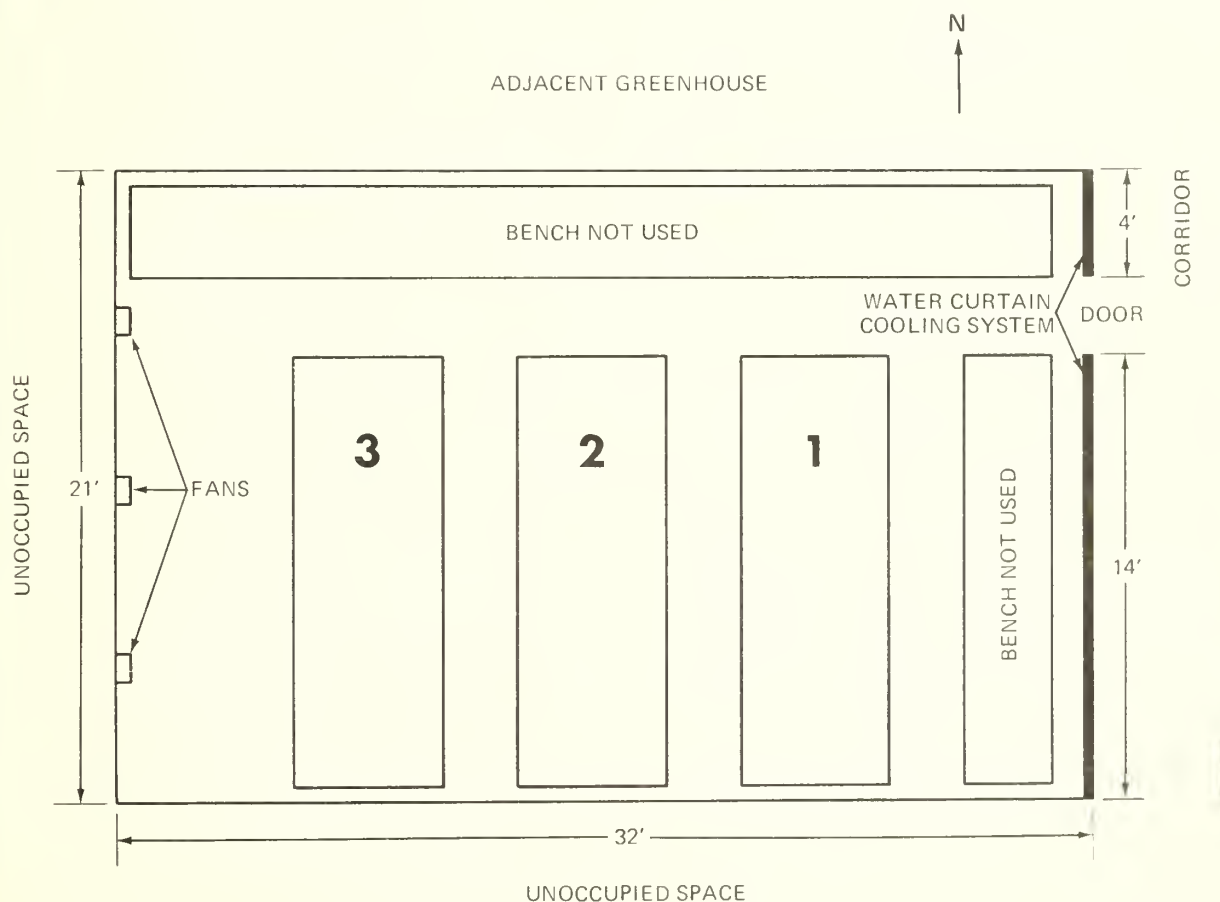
Greenhouse plan showing the three benches (1, 2, and 3) upon which the experimental plants were grown.
